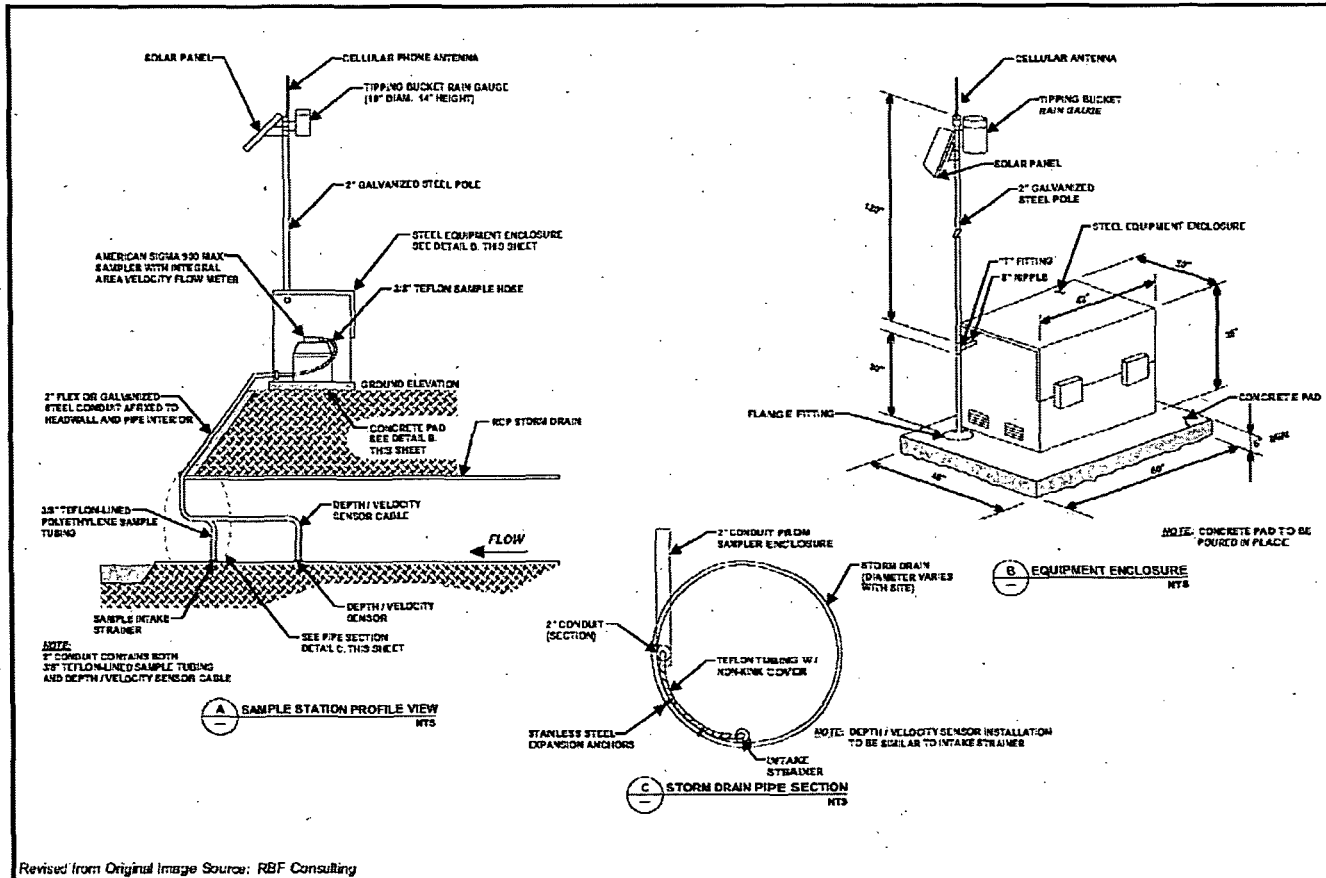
Typical KCLASS Stormwater Monitoring Station.
